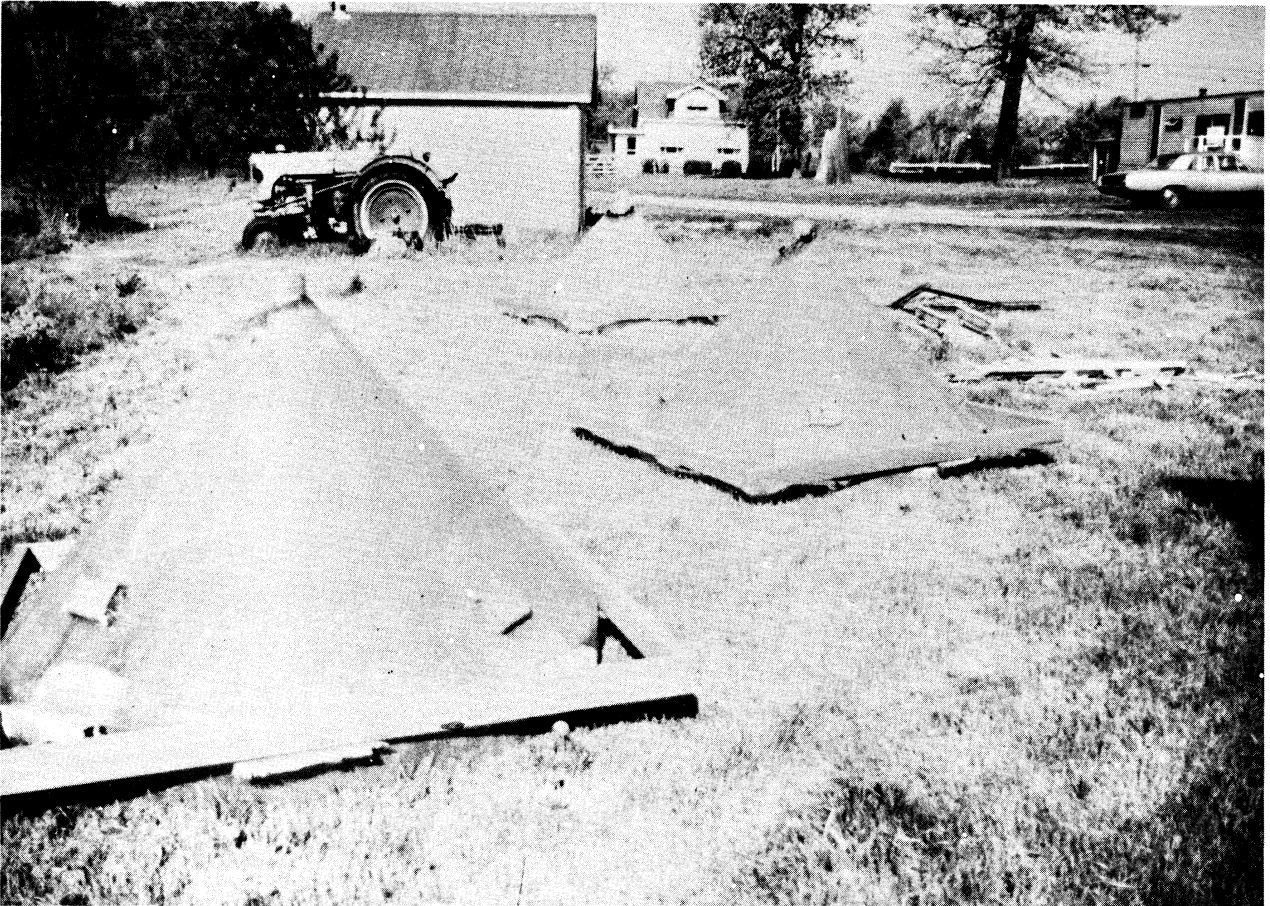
Fibre-glass funnels with new red-wood frames before being mounted on south side of building.
